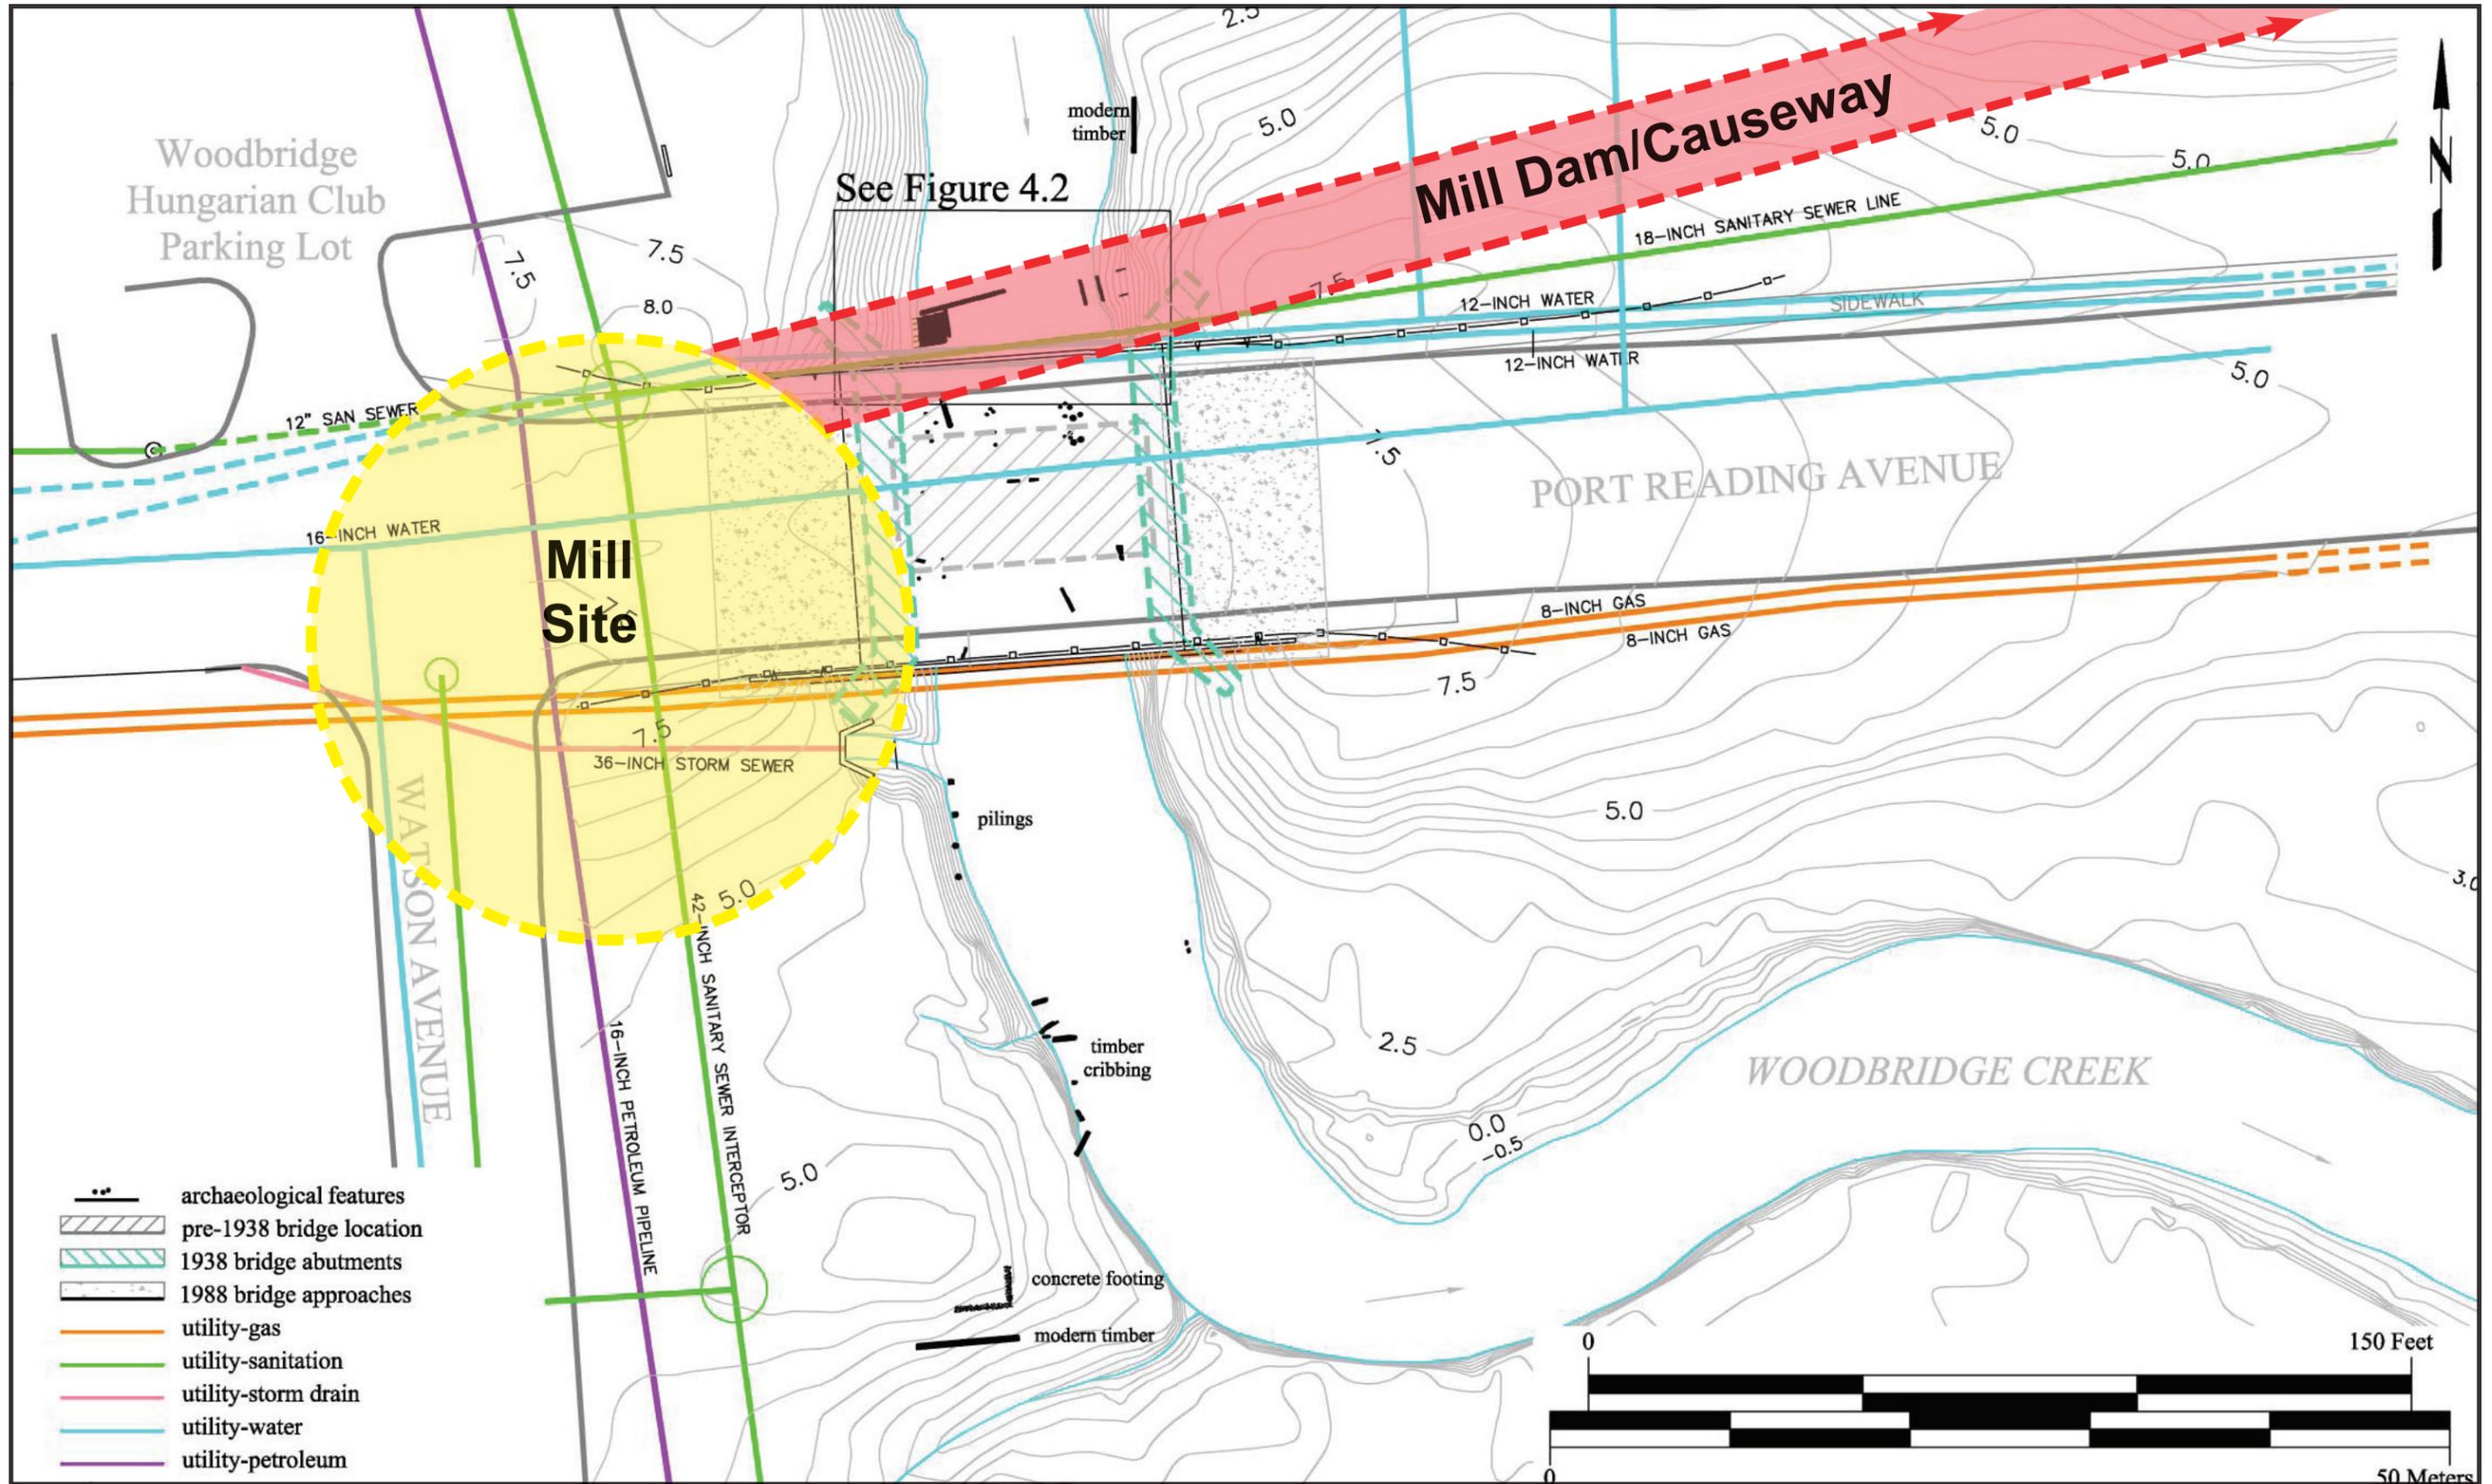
Overall Site Plan with Conjectured Location of Mill Site and Dam.
